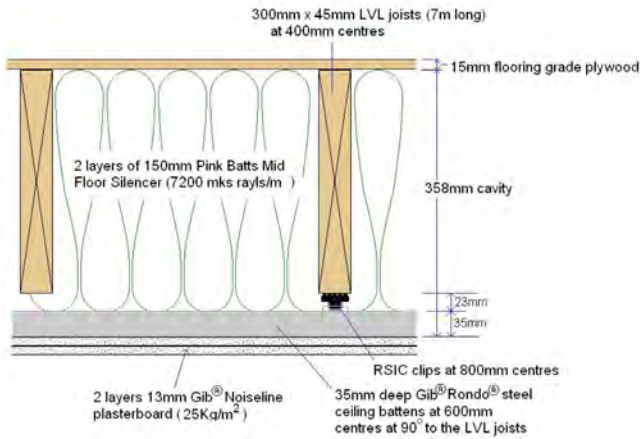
Cutaway schematics of a floor/ceiling system with a single plywood upper layer.
